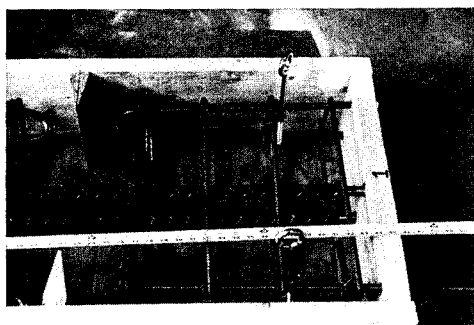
Steel reinforcement in right half of test specimen (wood blocks to create notches are at left)
